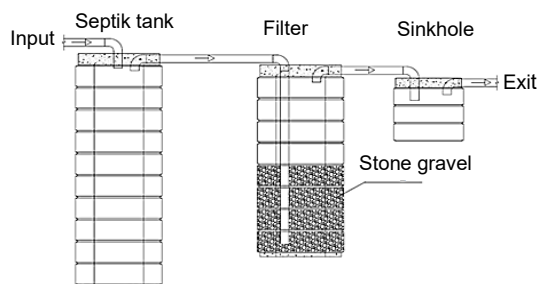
Section of the septic tank-filter-sinkhole of tires.
